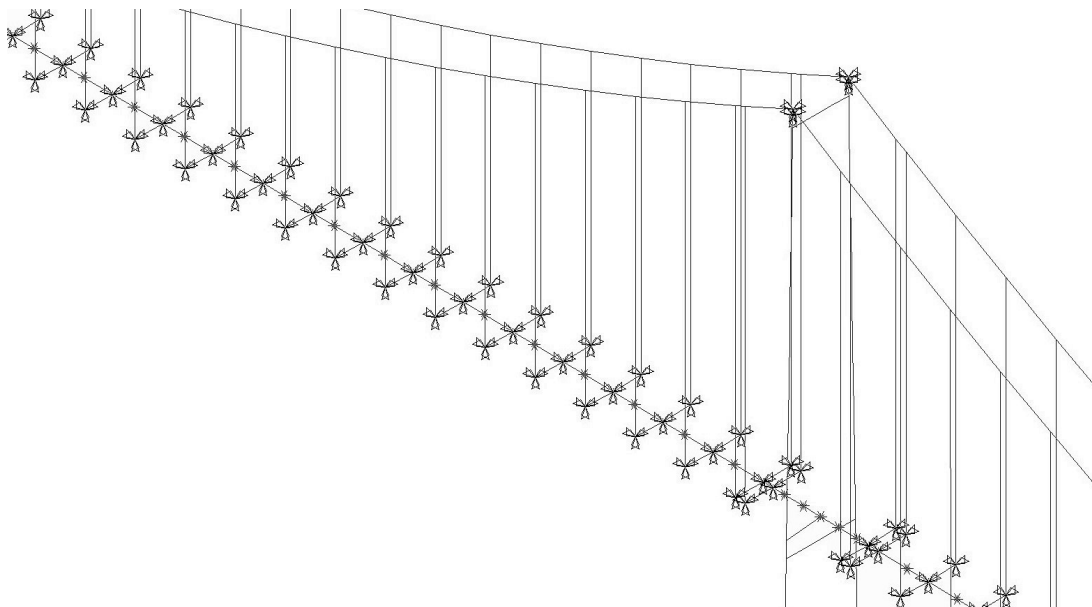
Lumped mass along the girder of the Chacao Bridge
